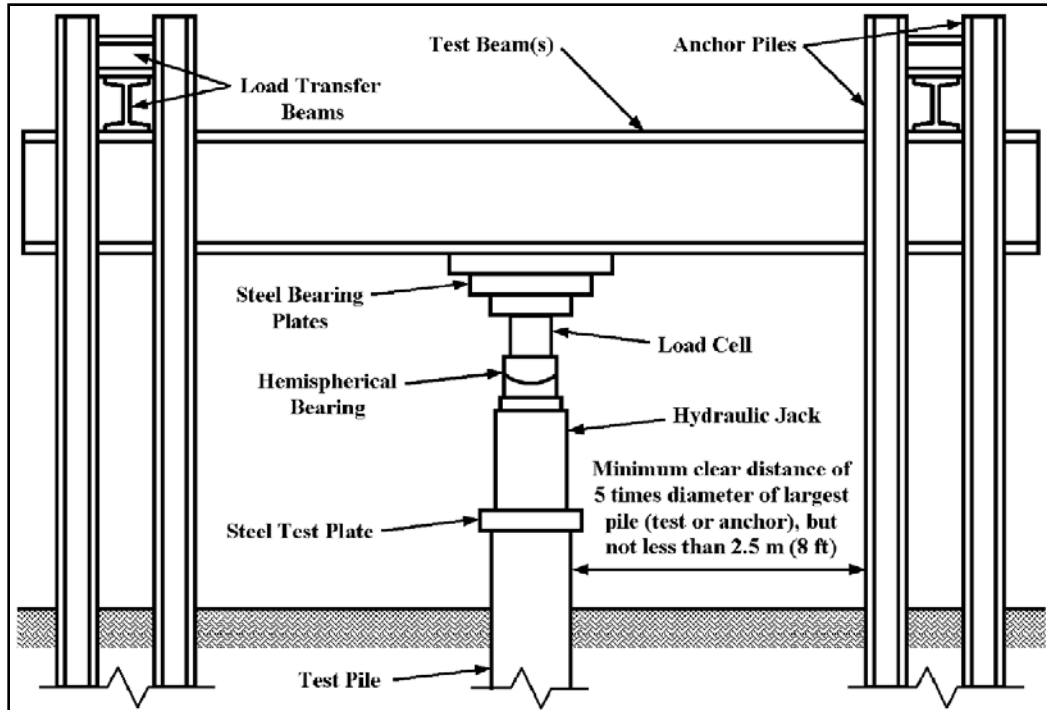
Schematic of hydraulic jack acting against anchored reaction frame in a typical setup for compression load test (ASTM D1143M – 07).
